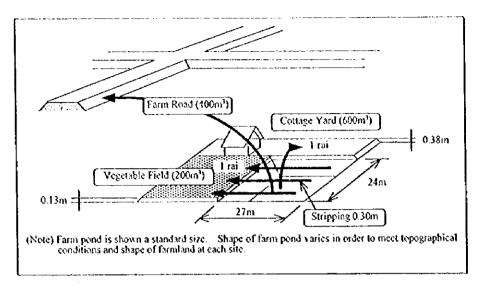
Residual Soil Disposal Plan for an Ordinary Farm Pond (1,200m³)
